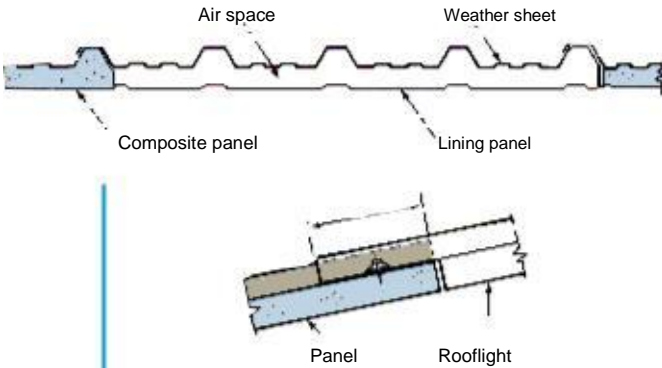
FACTORY ASSEMBLED ROOFLIGHT
